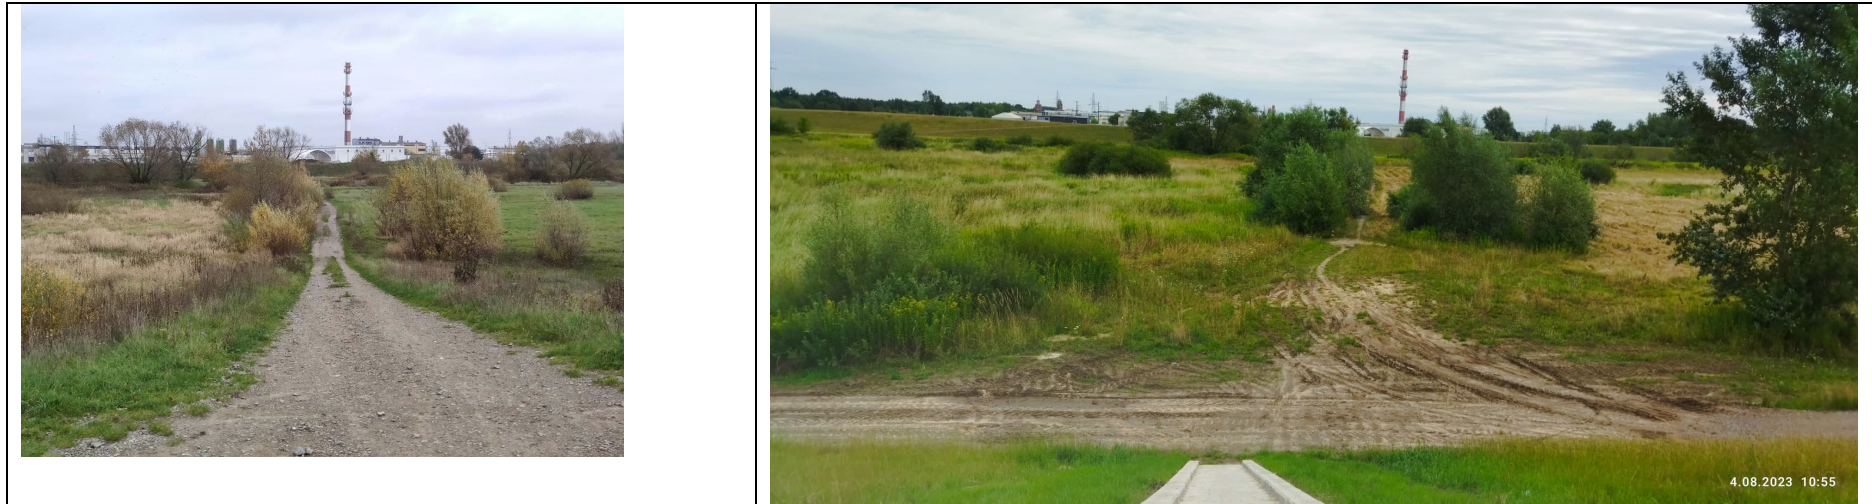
Road in the embanked area, access to pedestrian bridge.
